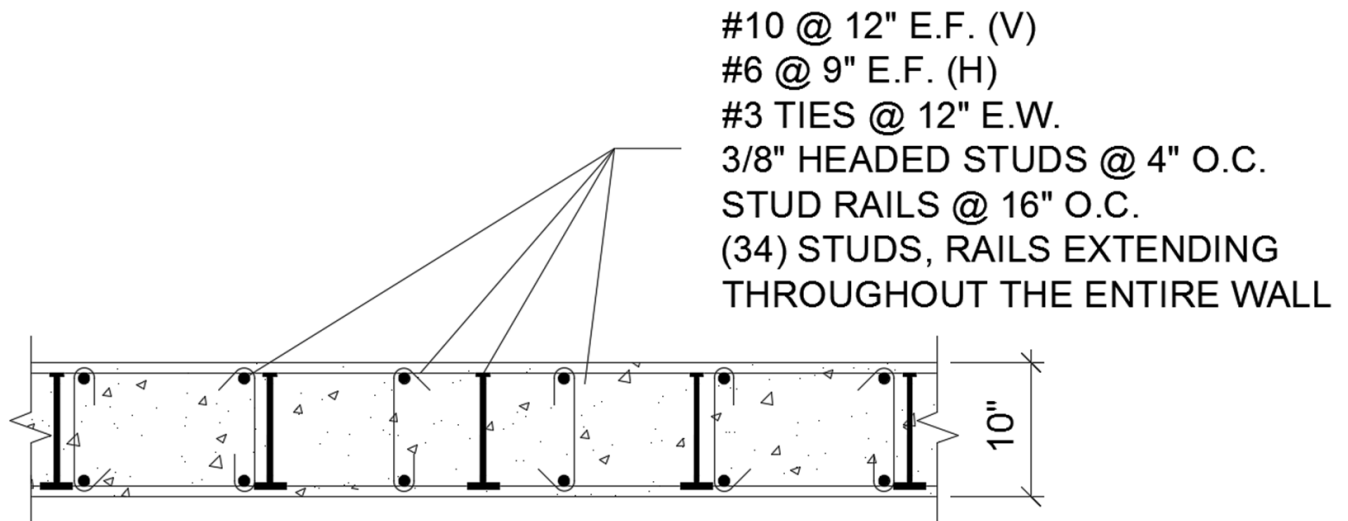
New exterior wall, cross-section at the ground floor level based on tsunami design requirements
